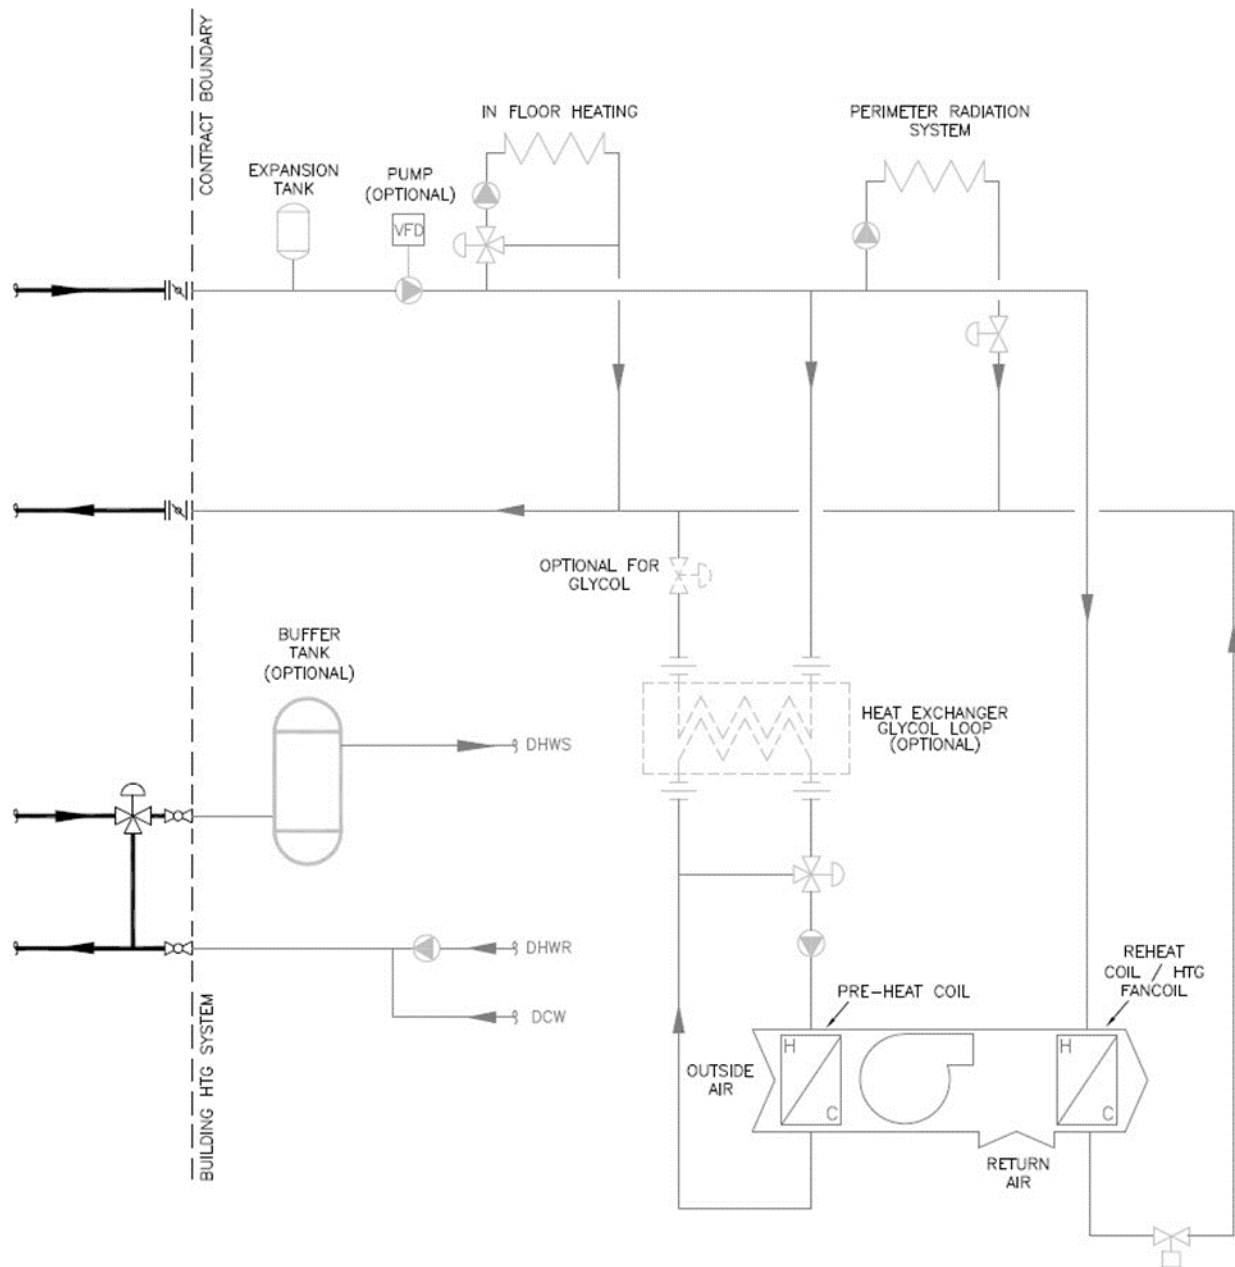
EXAMPLES OF TYPICAL SECONDARY (BUILDING) HEATING SYSTEMS
